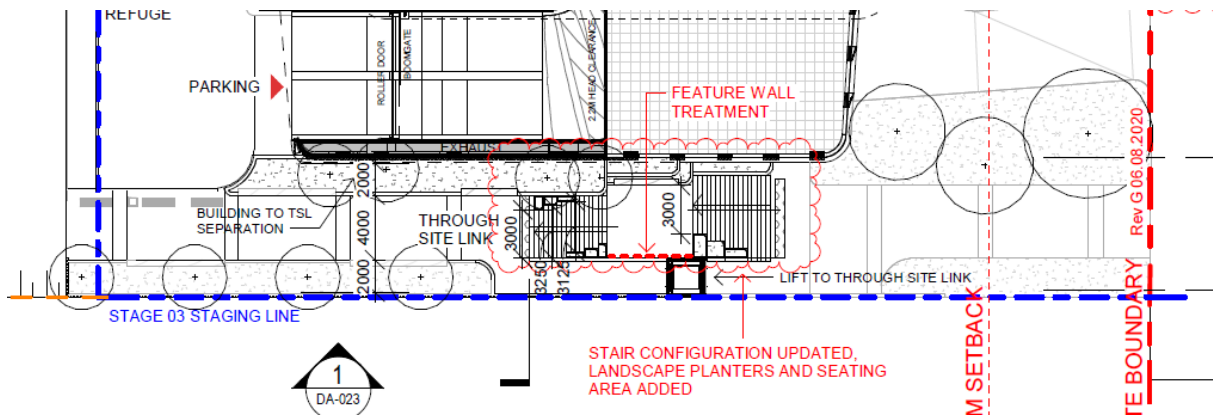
Extract of site plan for Building C, showing proposed through site link to the south east of the proposed building
